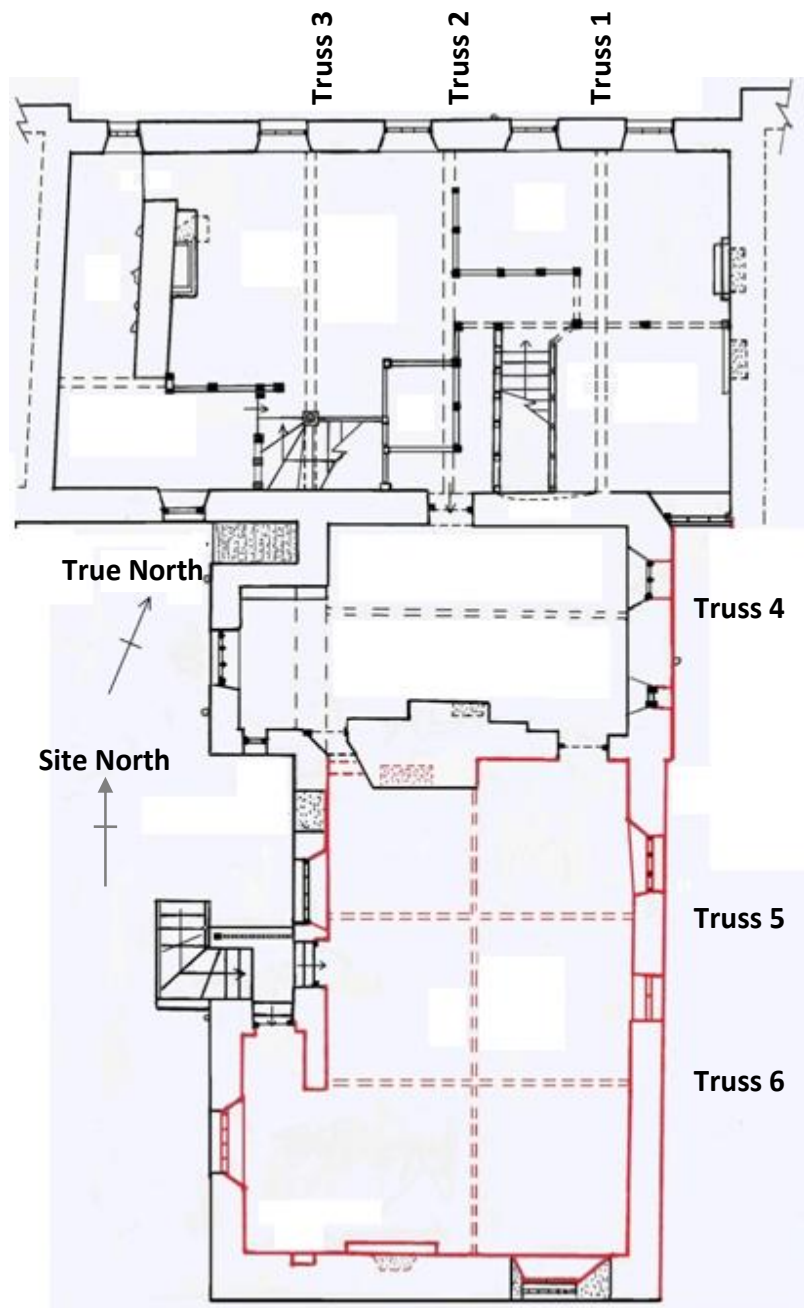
Plan of Sleddall Hall (at first floor level) to show arrangement and layout of the roof trusses (after Cumbria Vernacular Buildings Group survey)
